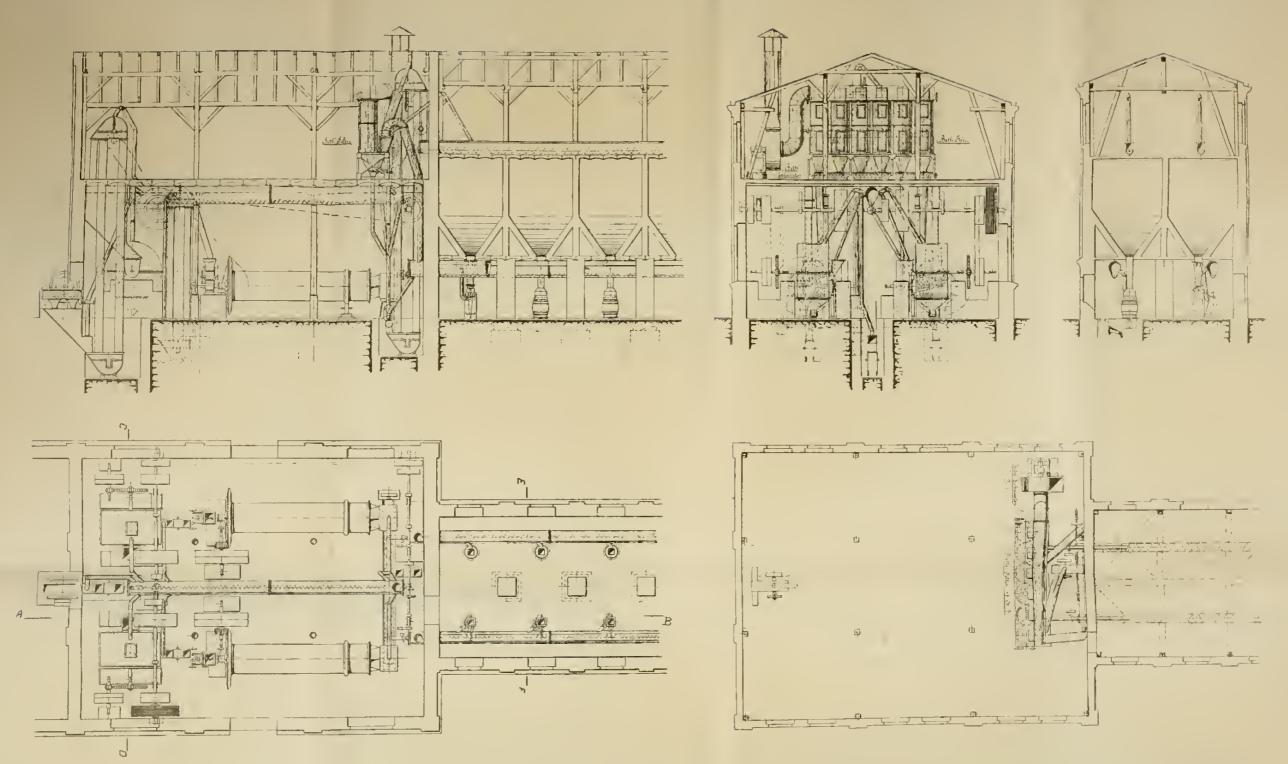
Complete Dust-Collecting Plant in connection with a Cement Mill and Warehouse
